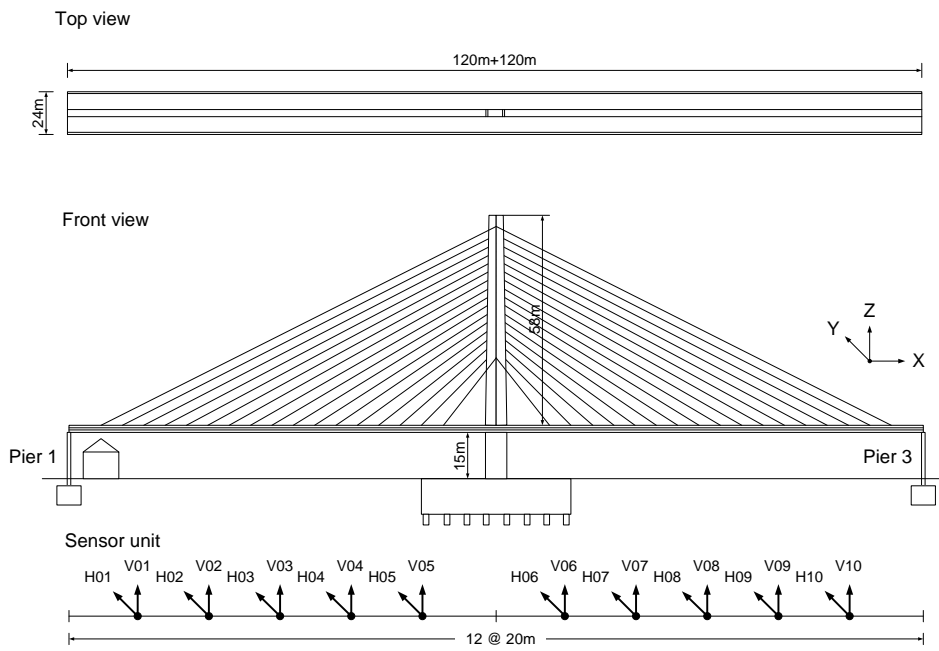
Front view and top view of the Gi-Lu cable-stayed bridge.
